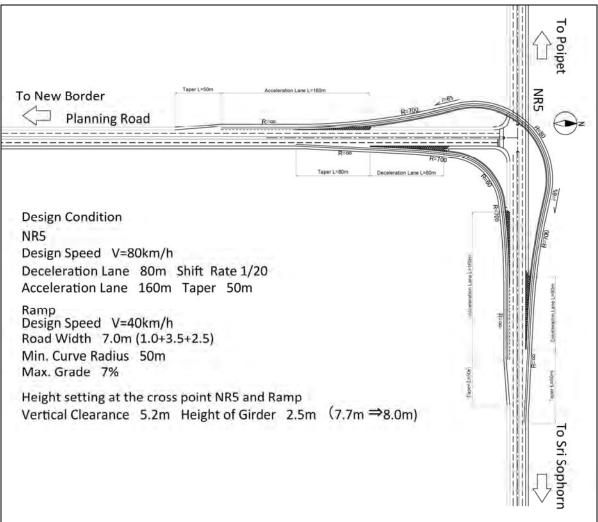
Intersection with the Access Road to the New Border Facility (With Grade-Separated Left-Turn Ramp)
